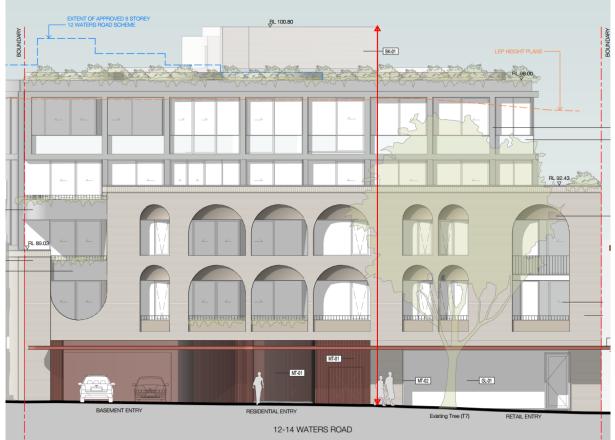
Extract from architectural west elevation drawing DA-0501 - Vertical red line showing the maximum building height of the proposed development
